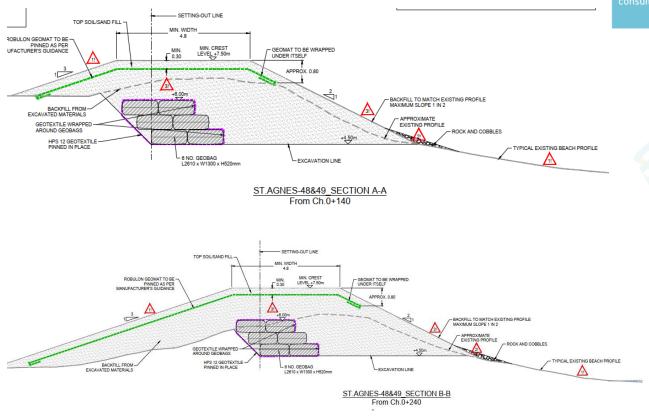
Cross-sections for revised design at Periglis (HR Wallingford, 2023)
